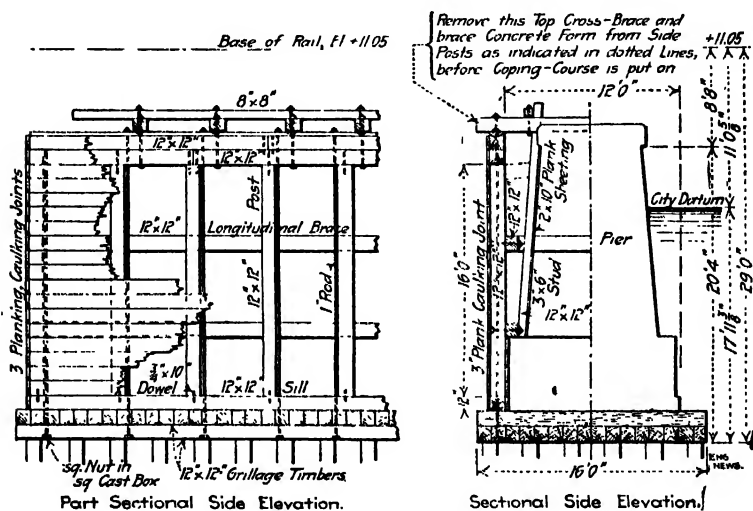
Cofferdam for Rest Pier at Chicago and Northwestern Railway Lift Bridge at Kinzie Street, Chicago.
